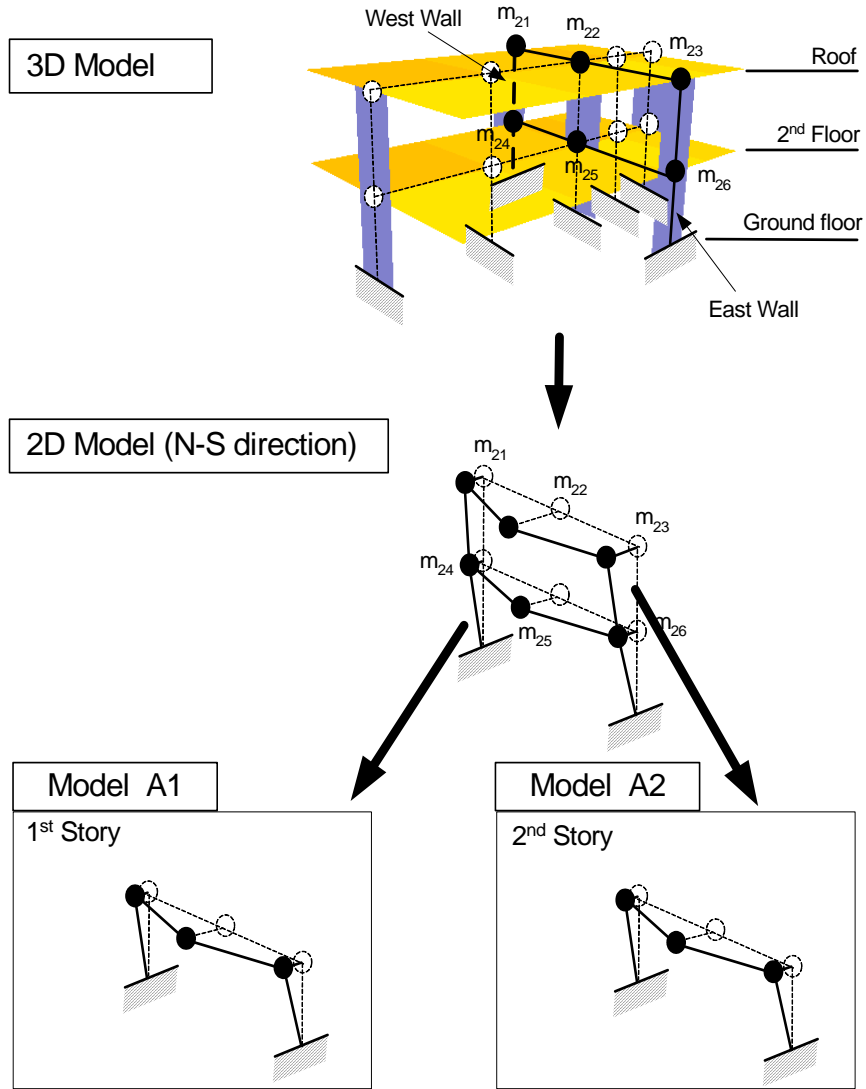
Structural separation of the two-story building in the N-S direction.
